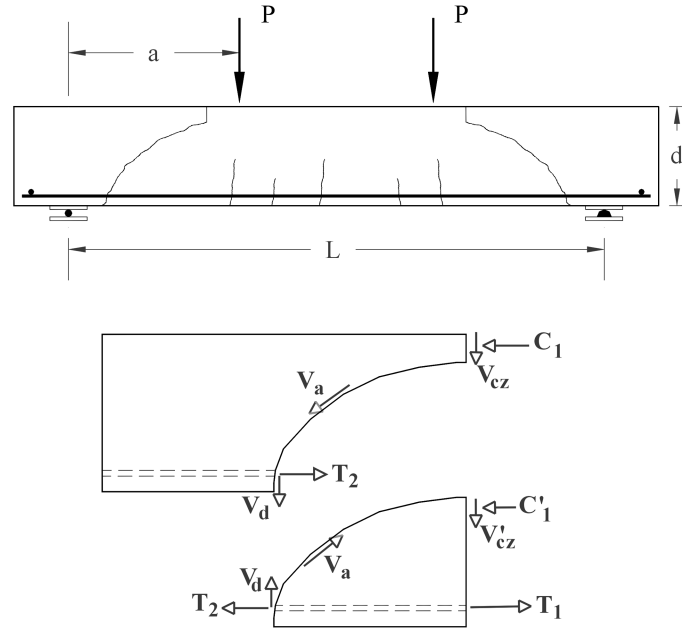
Shear transfer mechanisms in reinforced concrete beam without web reinforcement
